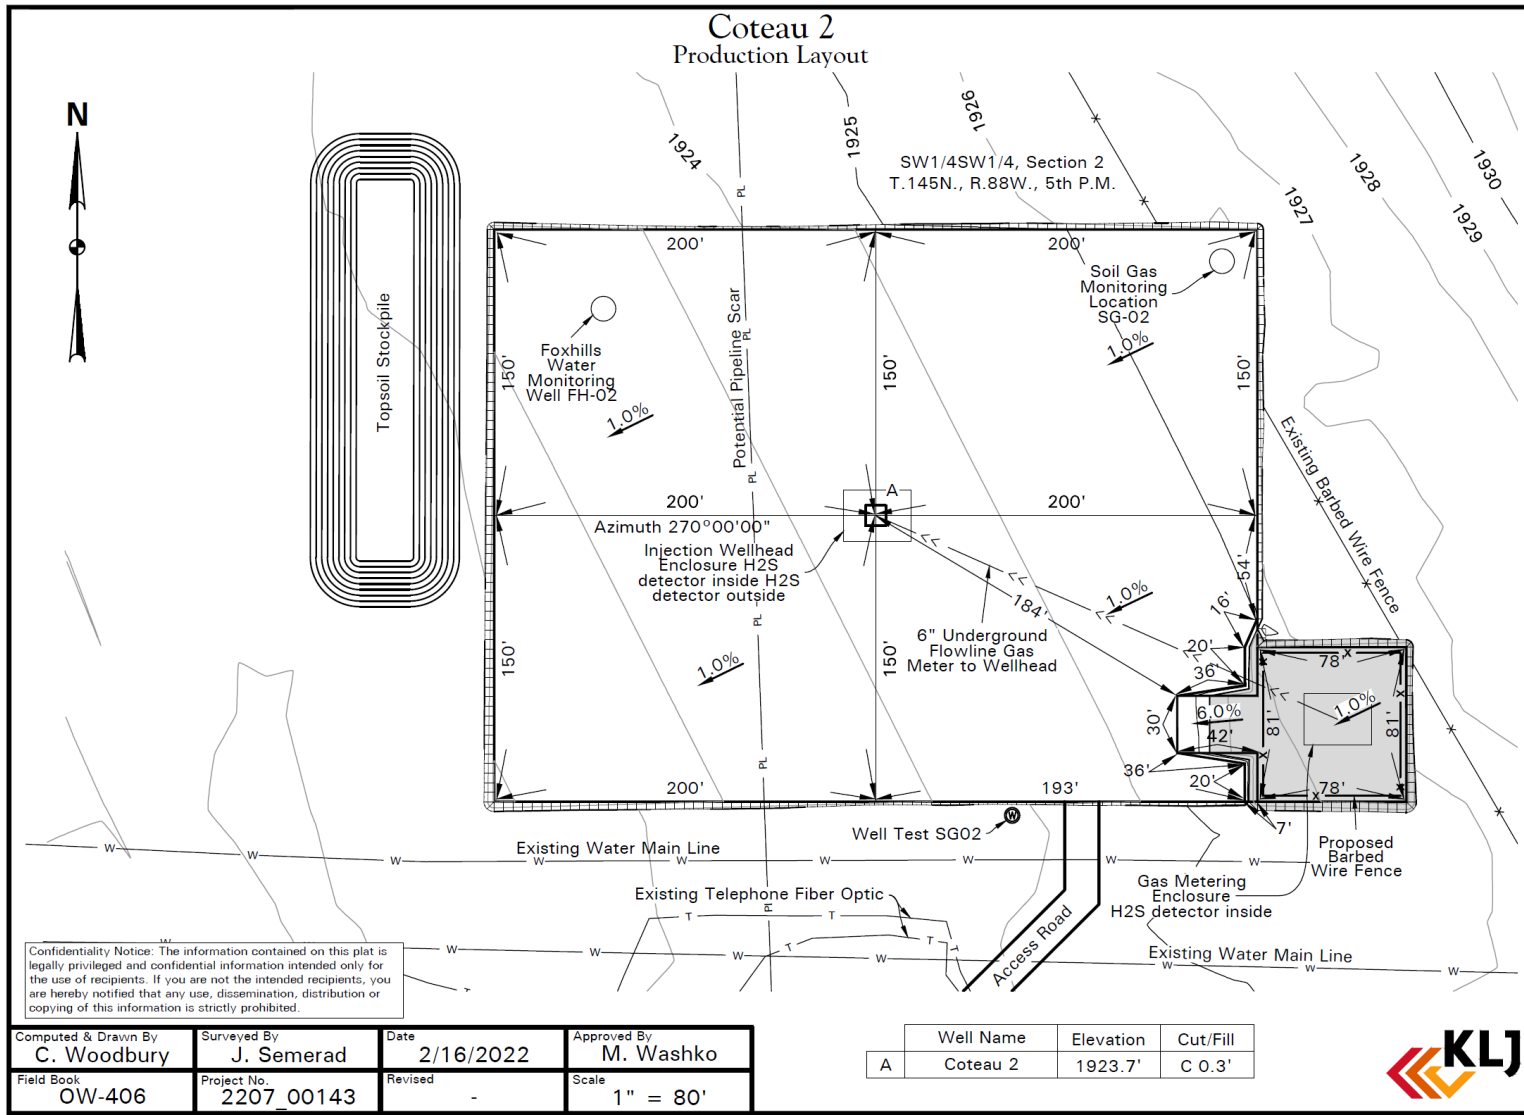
B. Well pad drawing of the Coteau 2 well location.
